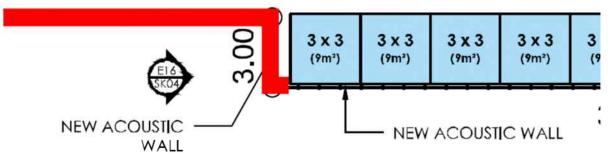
Plan showing recommended acoustic wall extent (red line) Source: Resonate
